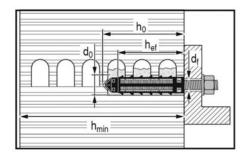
Hollow and solid brick with threaded rod HIT-V-... and two sieve sleeves HIT-SC for deeper embedment depth (see Table B6)
